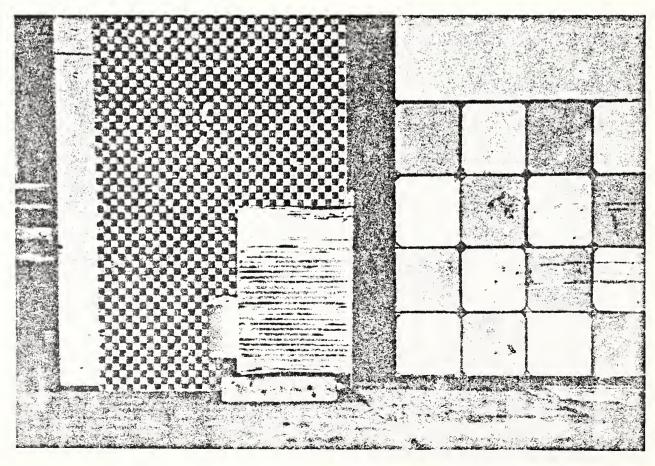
PRE-TEST MDB FACE - VIEW 2
